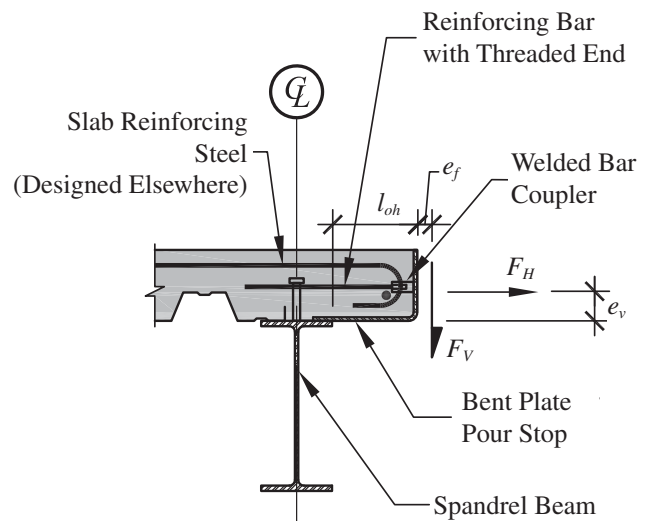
Section of slab edge with bent plate as pour stop with welded bar coupler.
